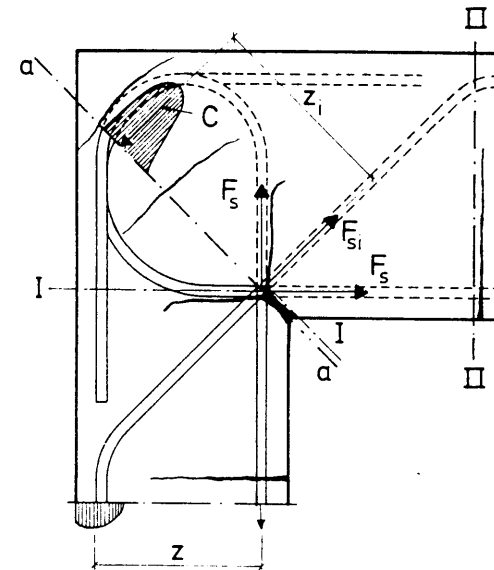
Internal Force System in Developed Corner Reinforcement Detail at Working Load
